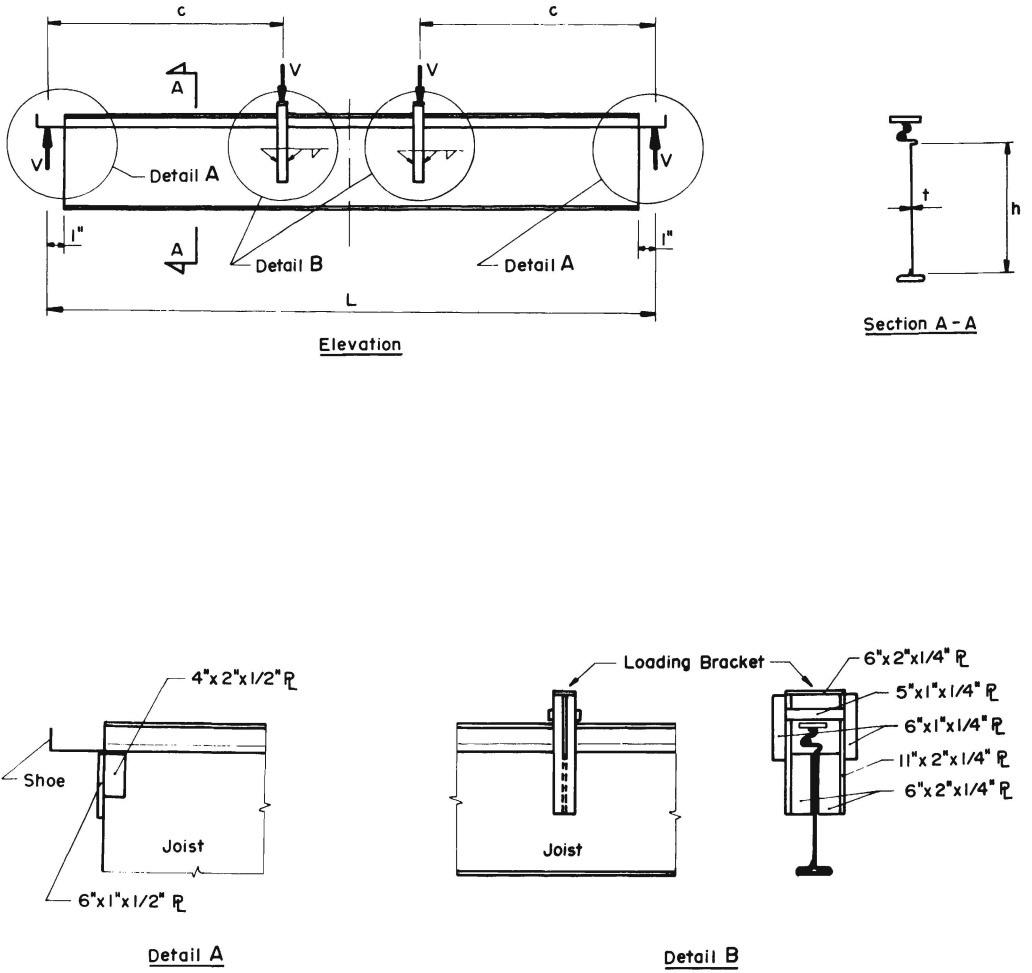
Details of cold-formed steel joist test specimens (1 in. = 25.4mm)
